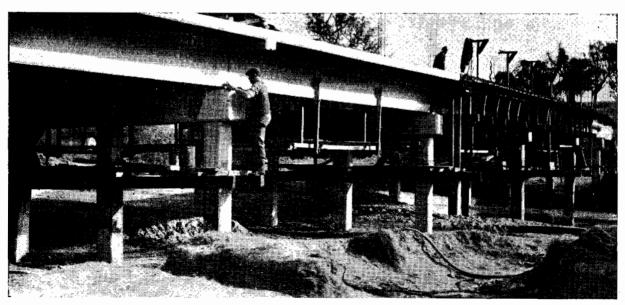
Precast concrete bridge over Yackandandah Creek in Shire of Yackandandah, showing details of precast crosshe ido, beams and formwork for deck.
